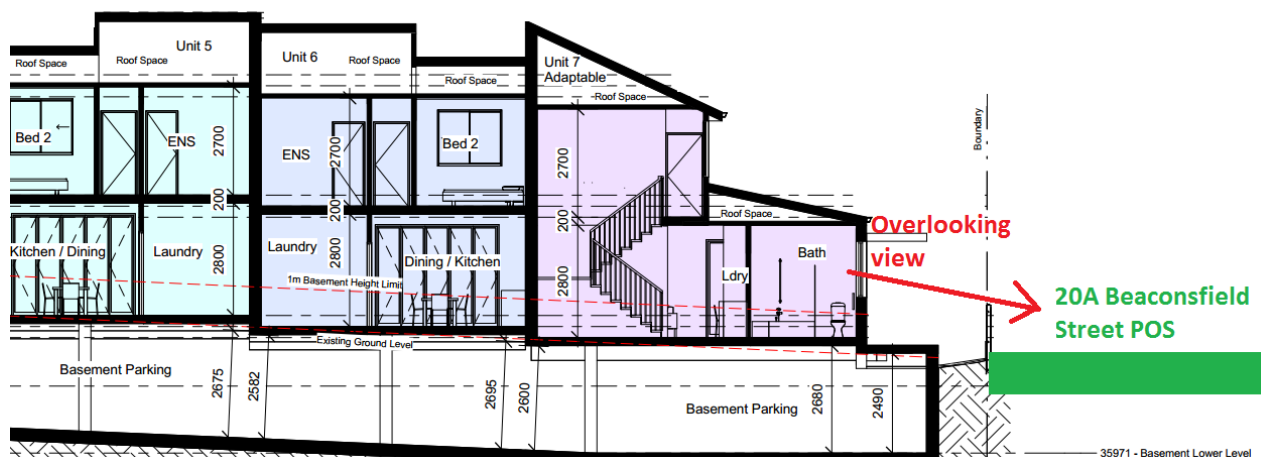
Section drawing indicating view lines from the ground floor of Unit 7 to adjoining POS
